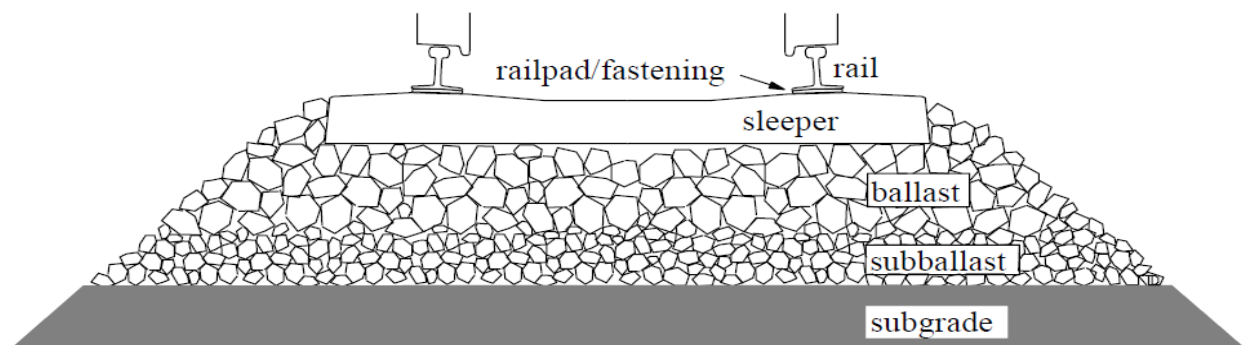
Track with its different components: rails, rail pads and fastenings, sleepers, ballast, sub-ballast, and subgrade (Dahlberg, 2004)
